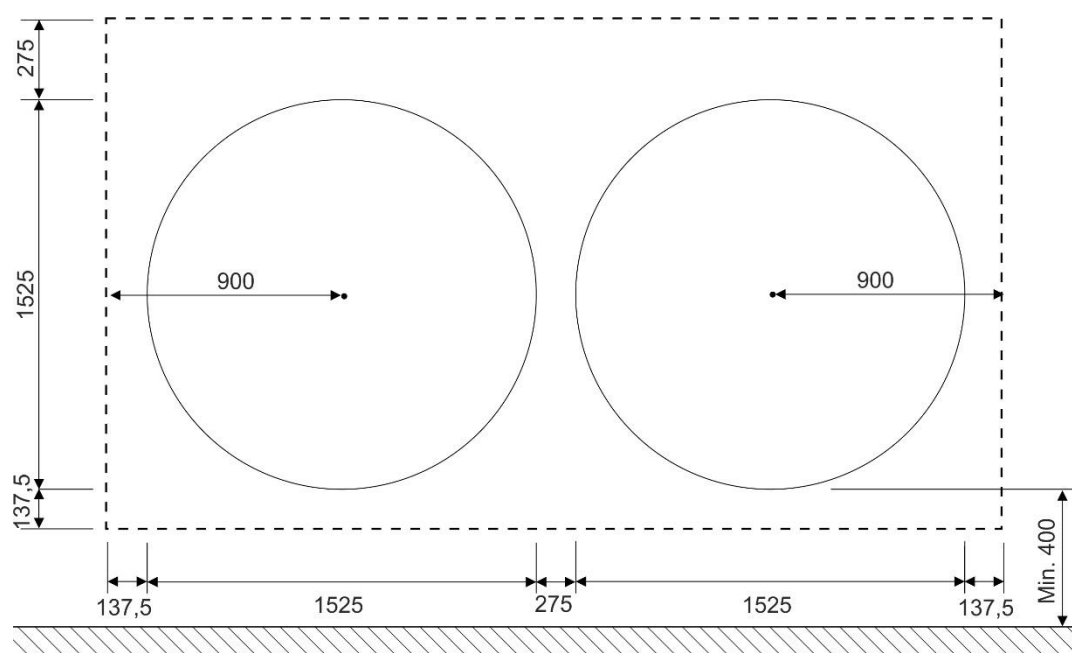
Minimum distance from BD-Blue 170C to wall, floor and ceiling
